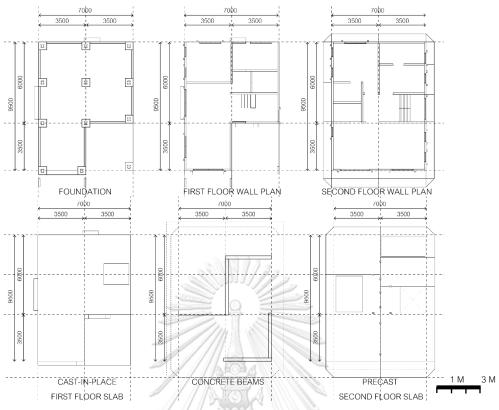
Proposed design module drawing of a A2 unit foundation, floor slabs and precast
